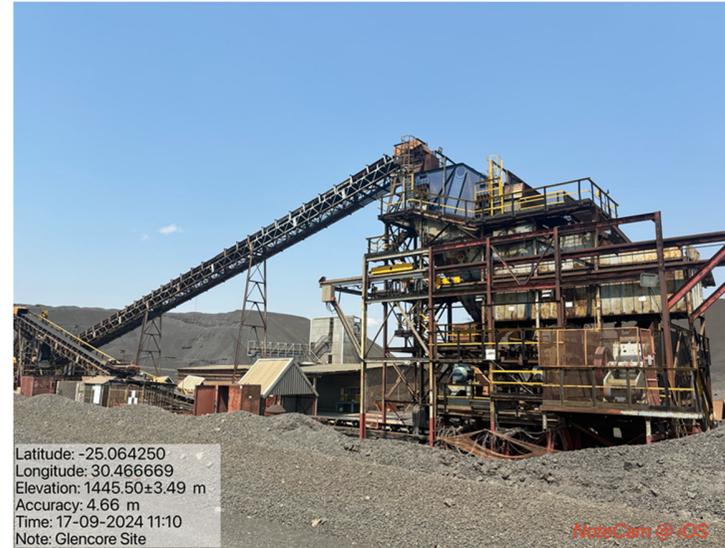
Lydenburg Smelter Internal Access Road to the Proposed Development Area
